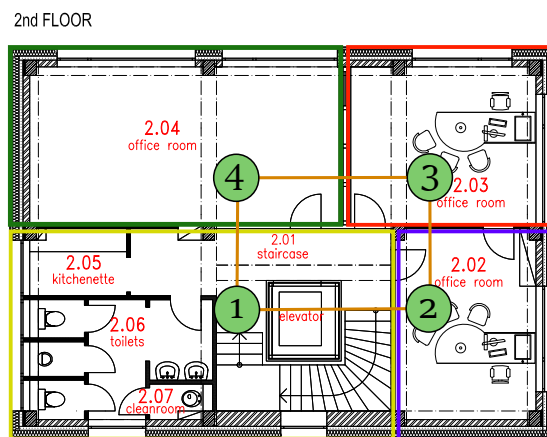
The 2nd-floor plan of the Fenix building forms a "four-zone building". Coloured rectangles denote individual zones' borders and the four-vertex graph represents zones' topology.
